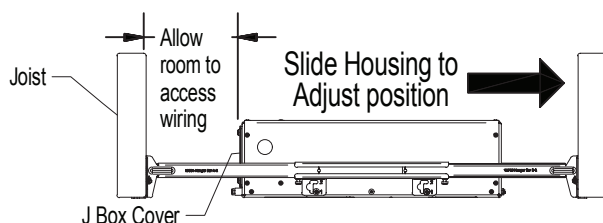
Horizontal Housing adjustment (Model 804S shown)
